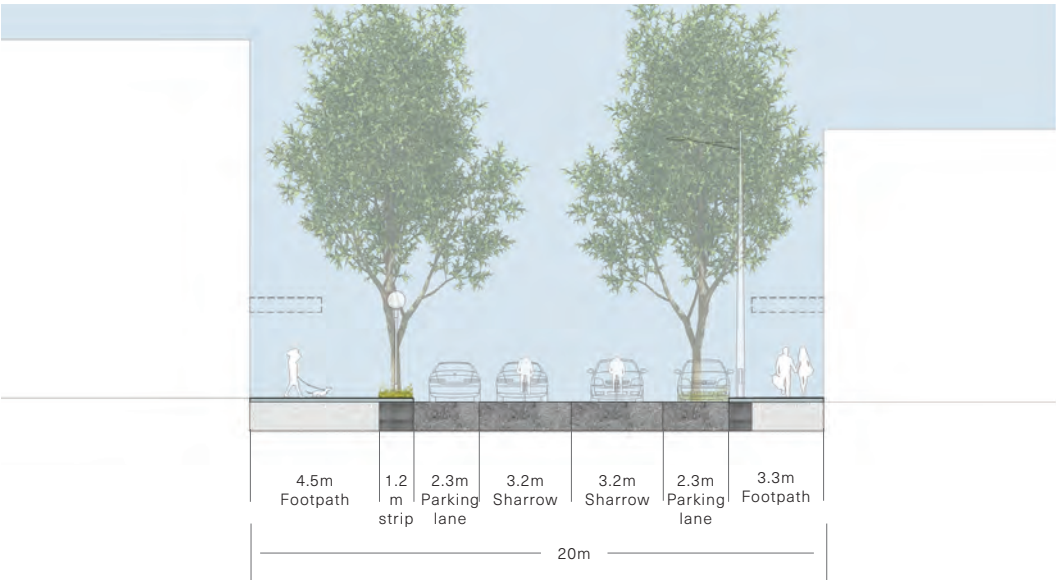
Bayley Street section A-A' showing the proposed condition
